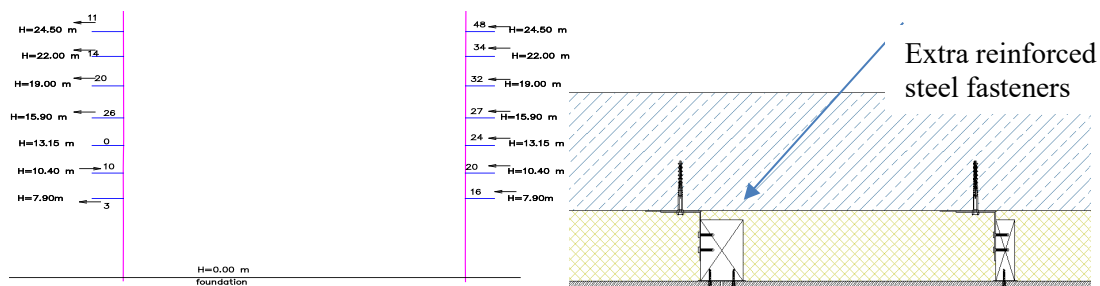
Façade vertical deviations and wooded frame mounting to the wall
